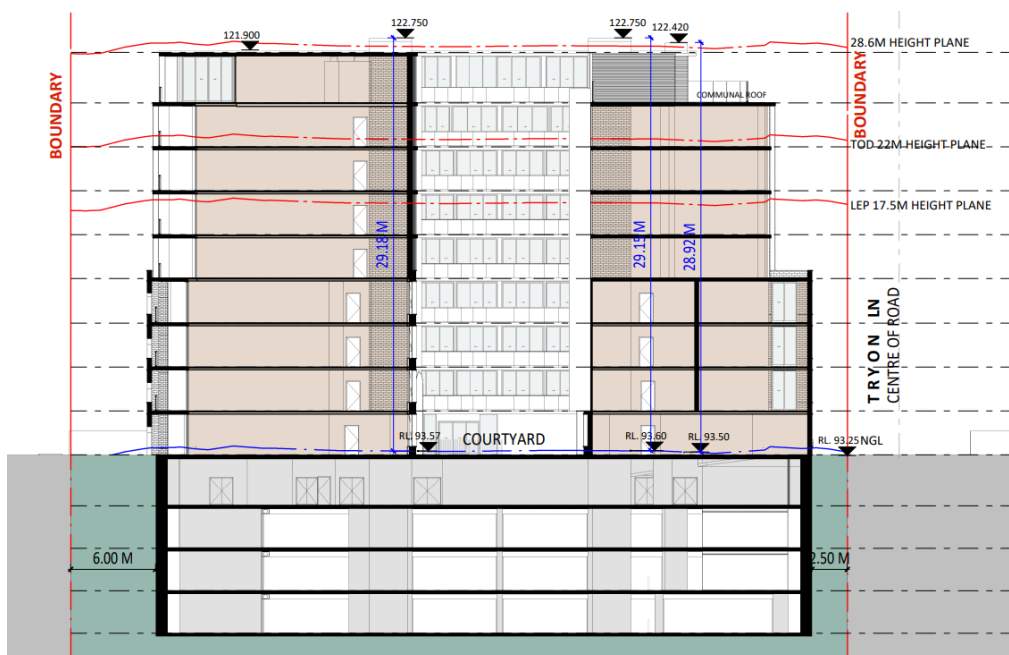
Section 2 detailing lift overrun height (Source: PTW)
